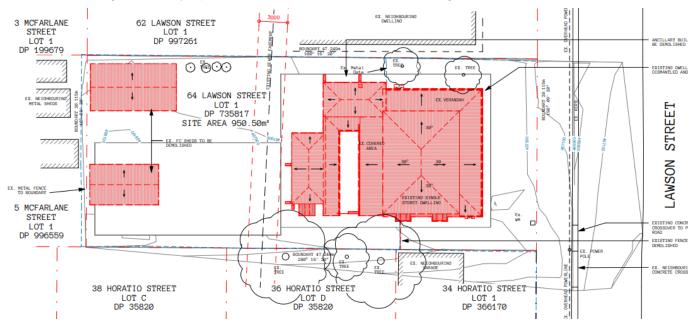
Proposed Demolition Plan of the "House" and Outbuildings at 64 Lawson St, Mudgee
